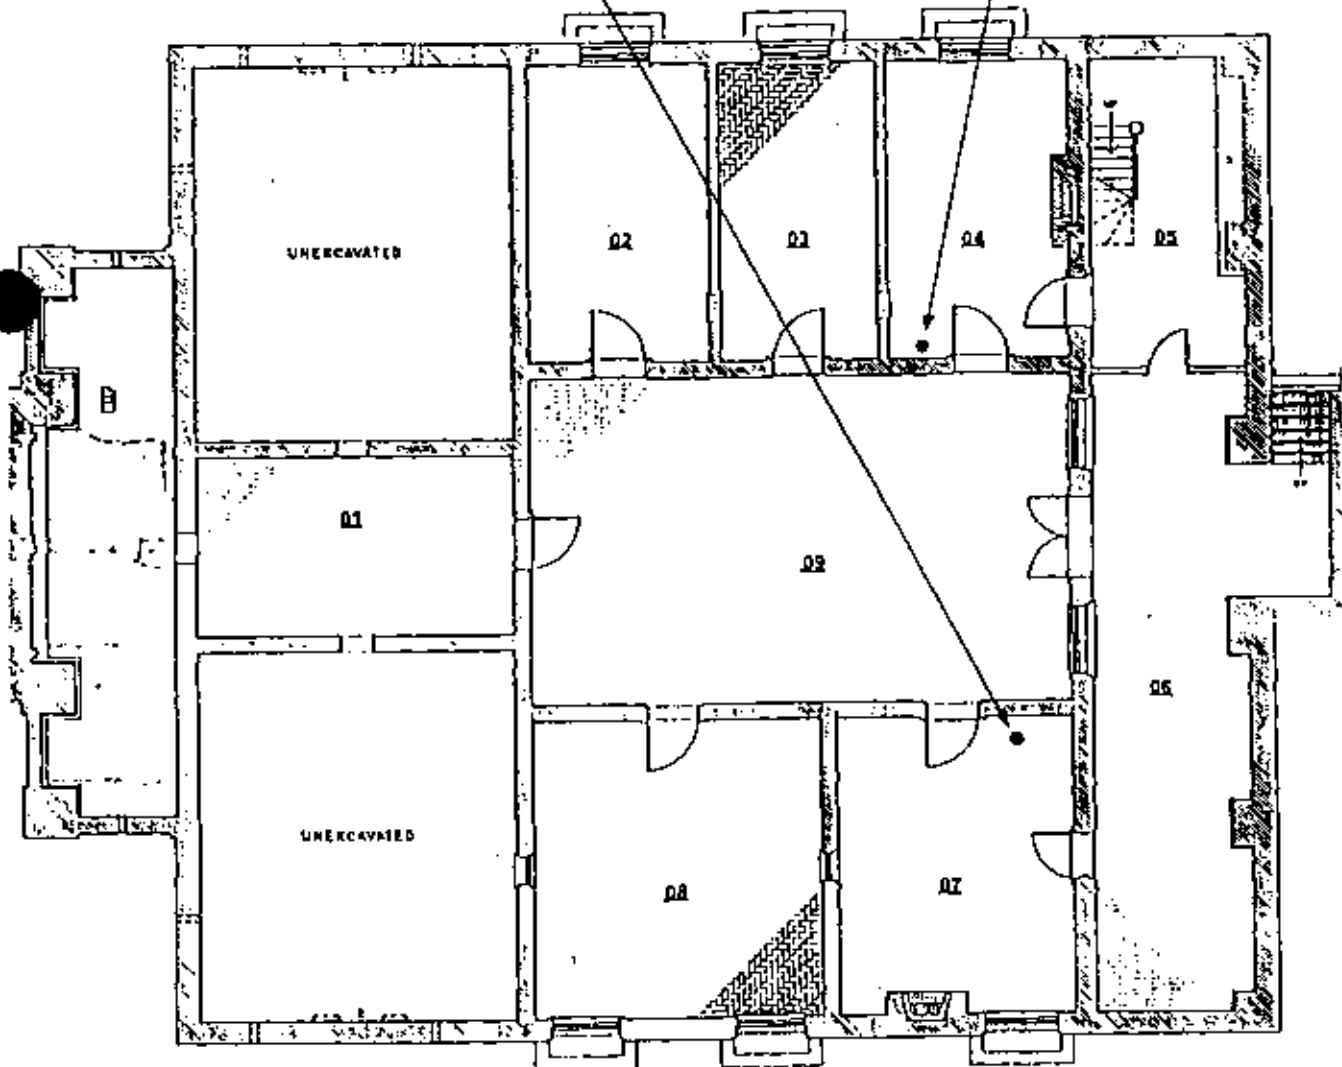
Melrose House Basement Plan - Location of Cores in Rooms 04 and 07
